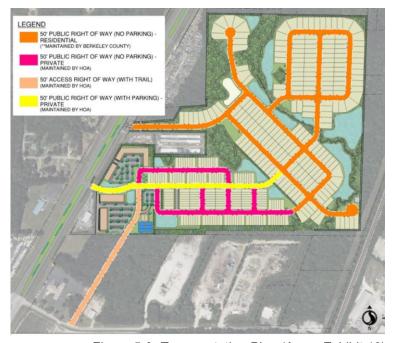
Transportation Plan (Appx. Exhibit 10)
